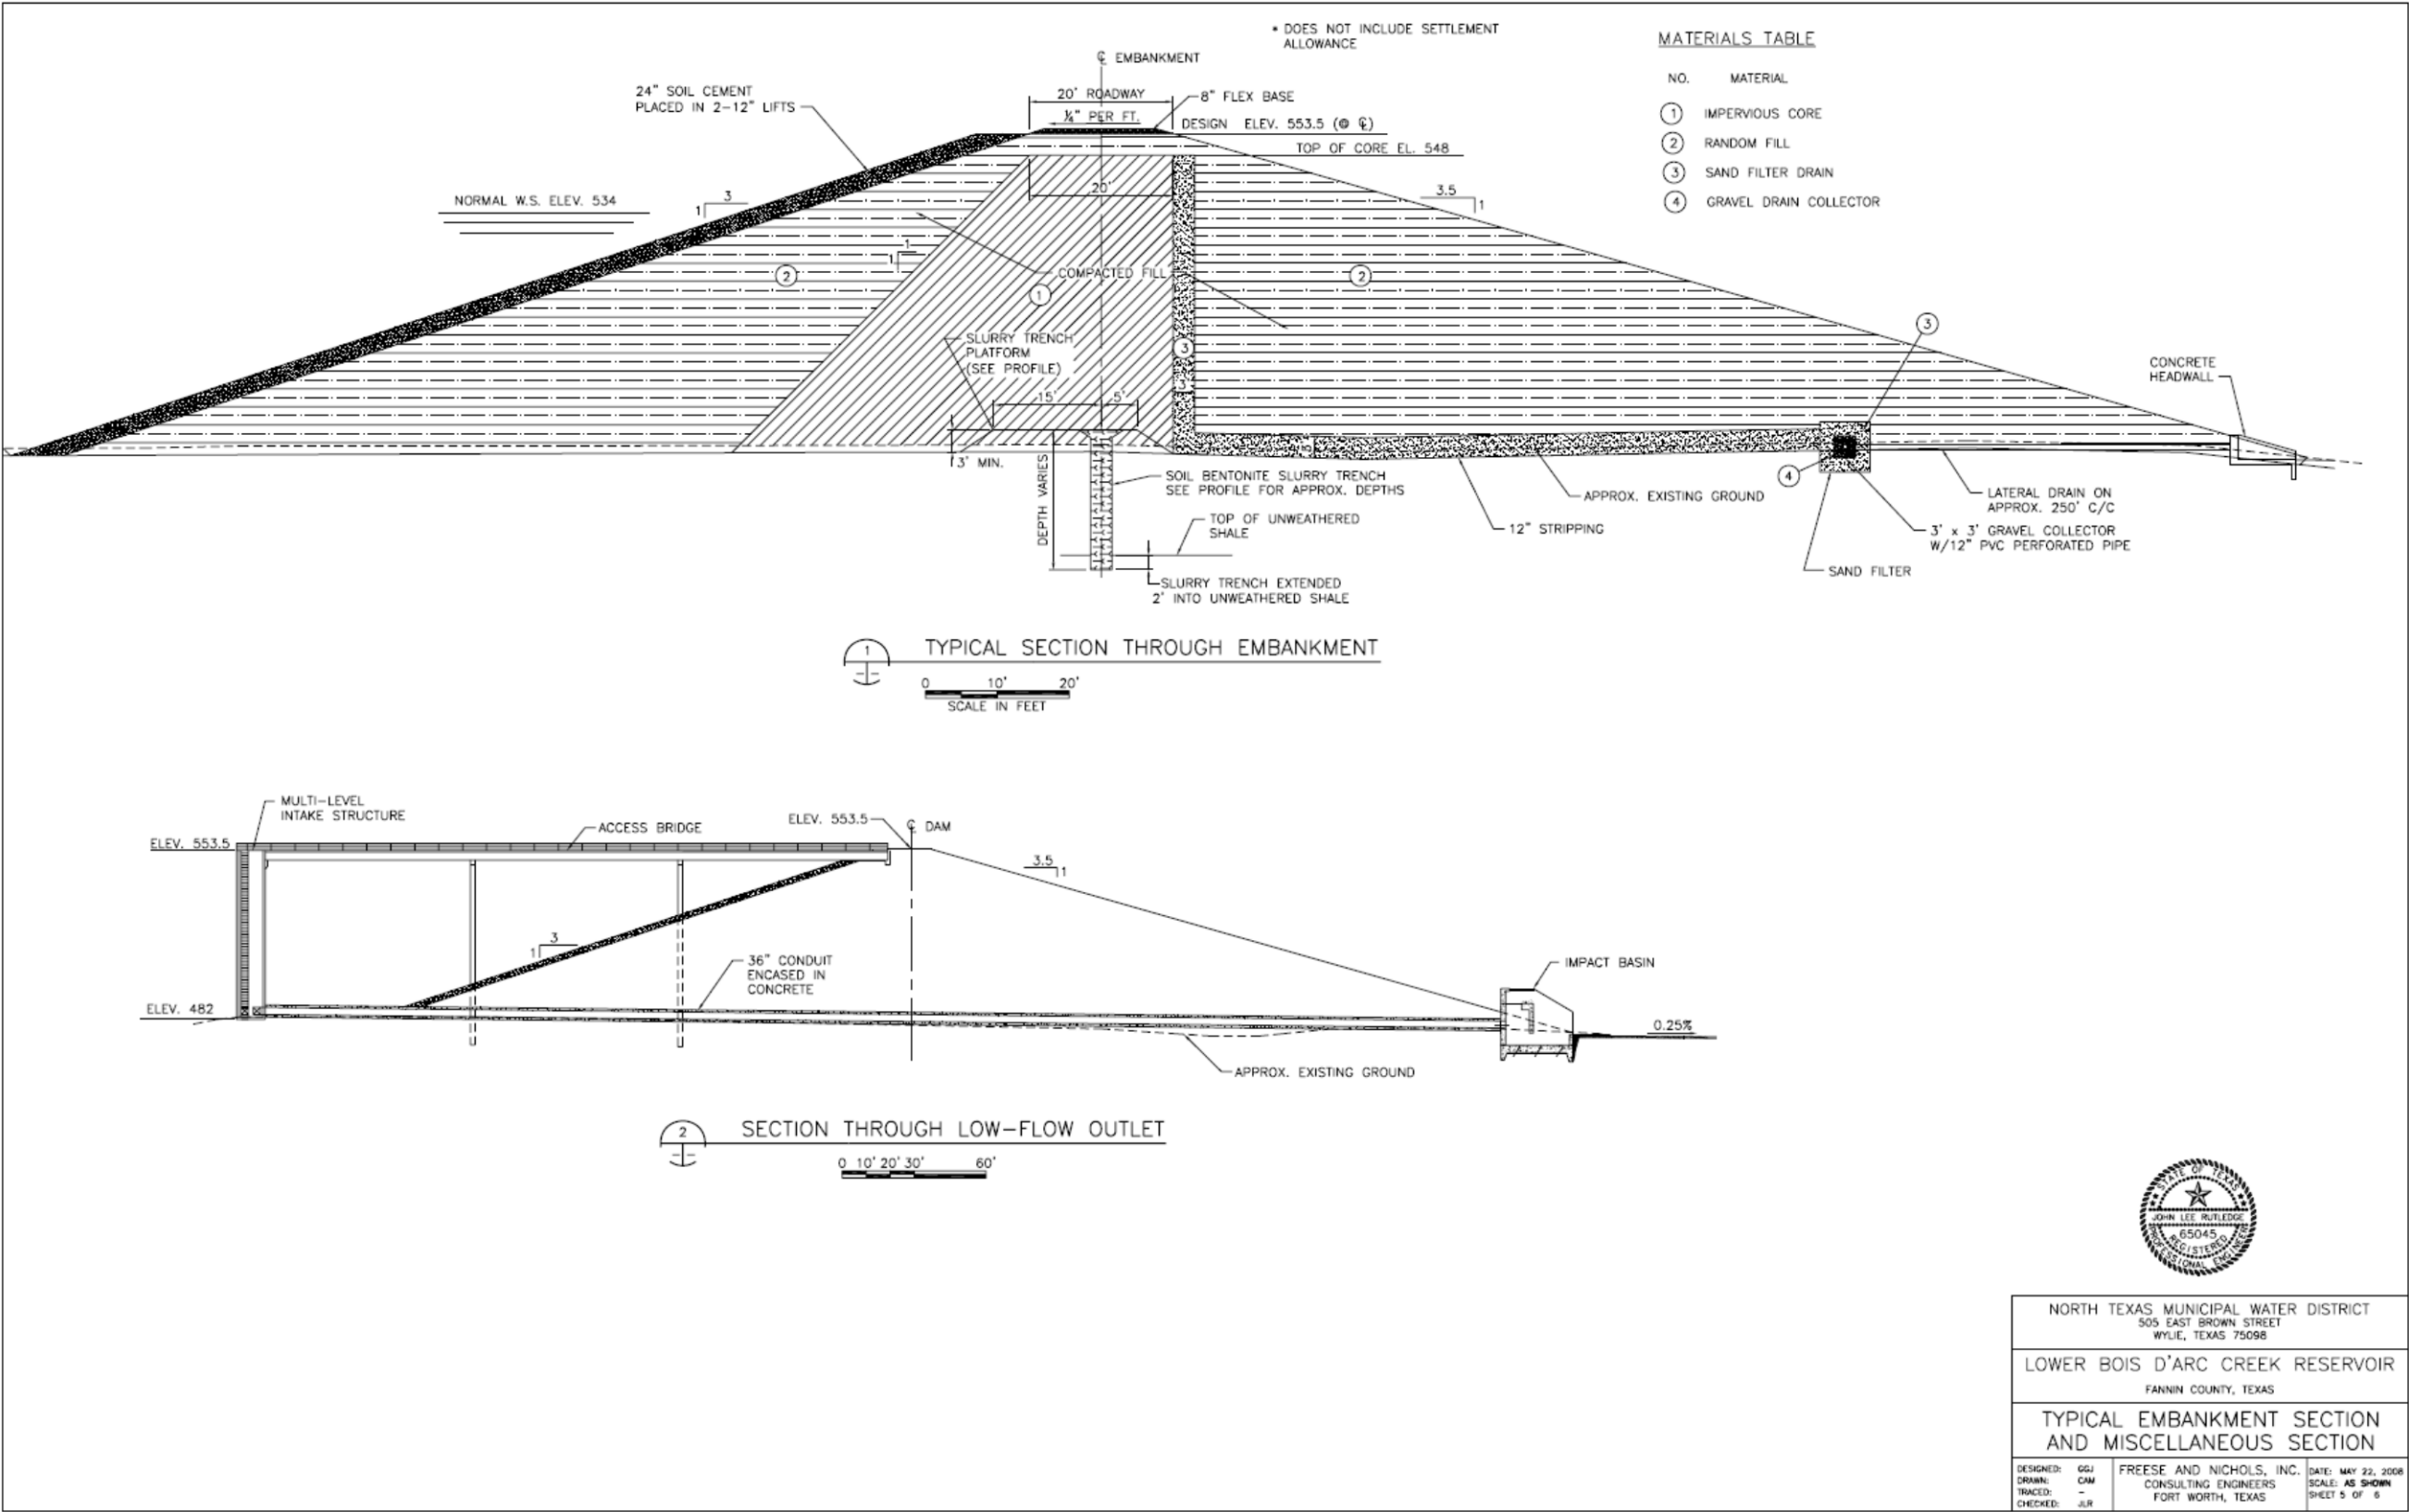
Preliminary drawings of Lower Bois d'Arc Reservoir dam cross-section
